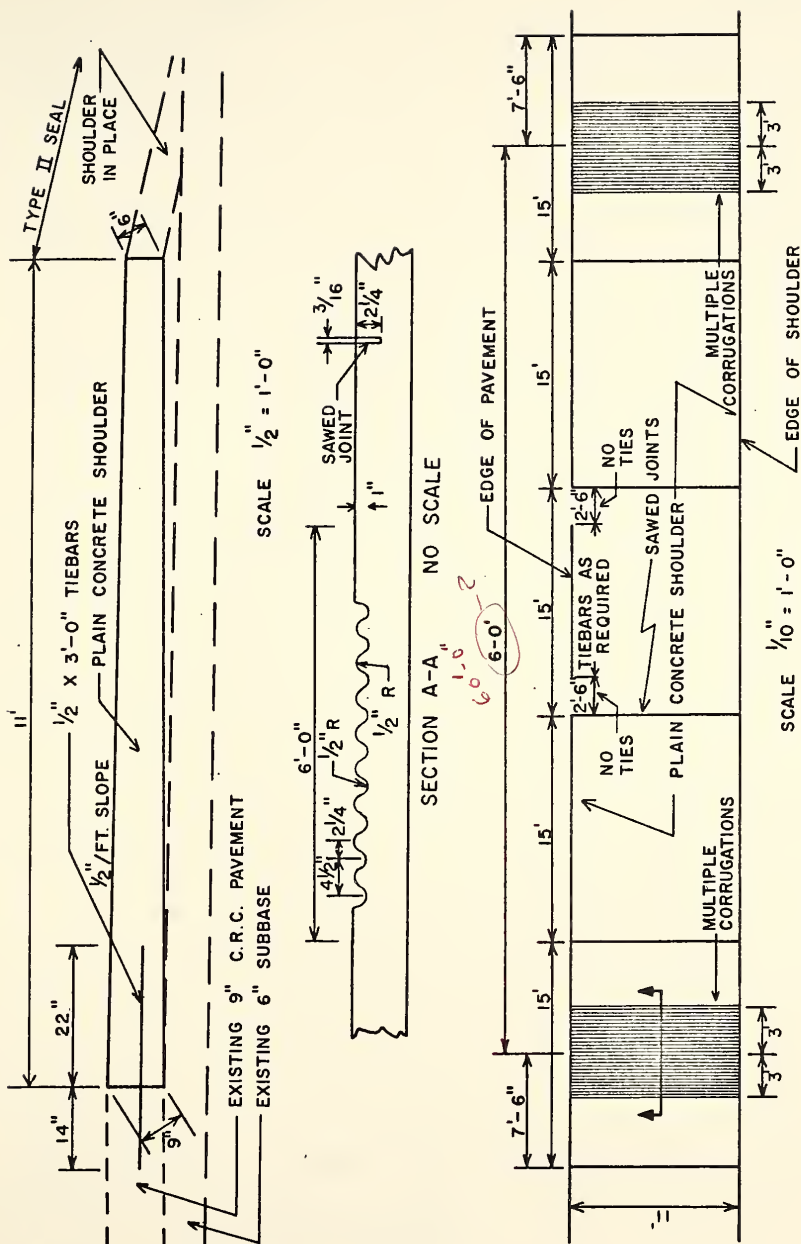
PLAIN CONCRETE SHOULDER DETAILS
